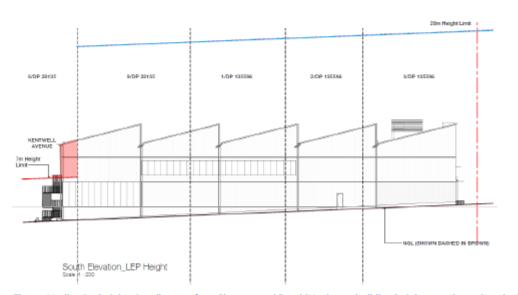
Indicative height plan diagram from Showground Road (Maximum building height-southern elevation)
